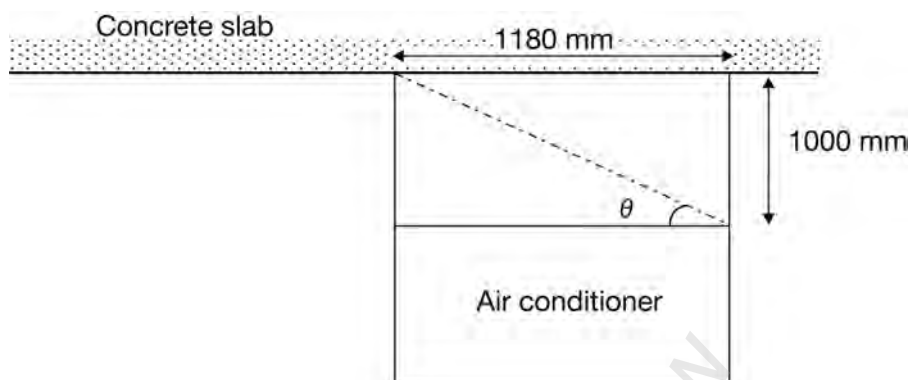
Bracing layout for air conditioner suspended 1000 mm below concrete slab
